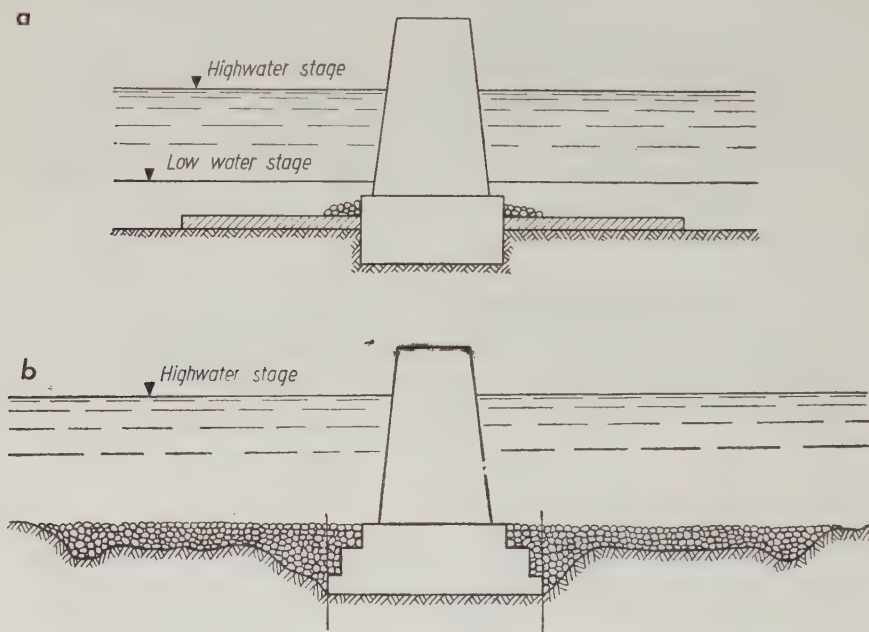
Protection of bridge pier against scour: *a* — brushwood mattresses, *b* — paving
